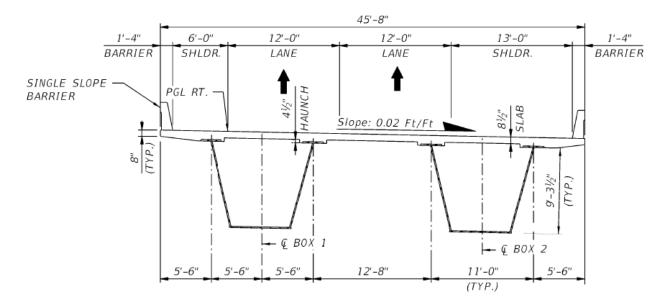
Bridge #17 Typical Section (Spans 1 thru 29)
